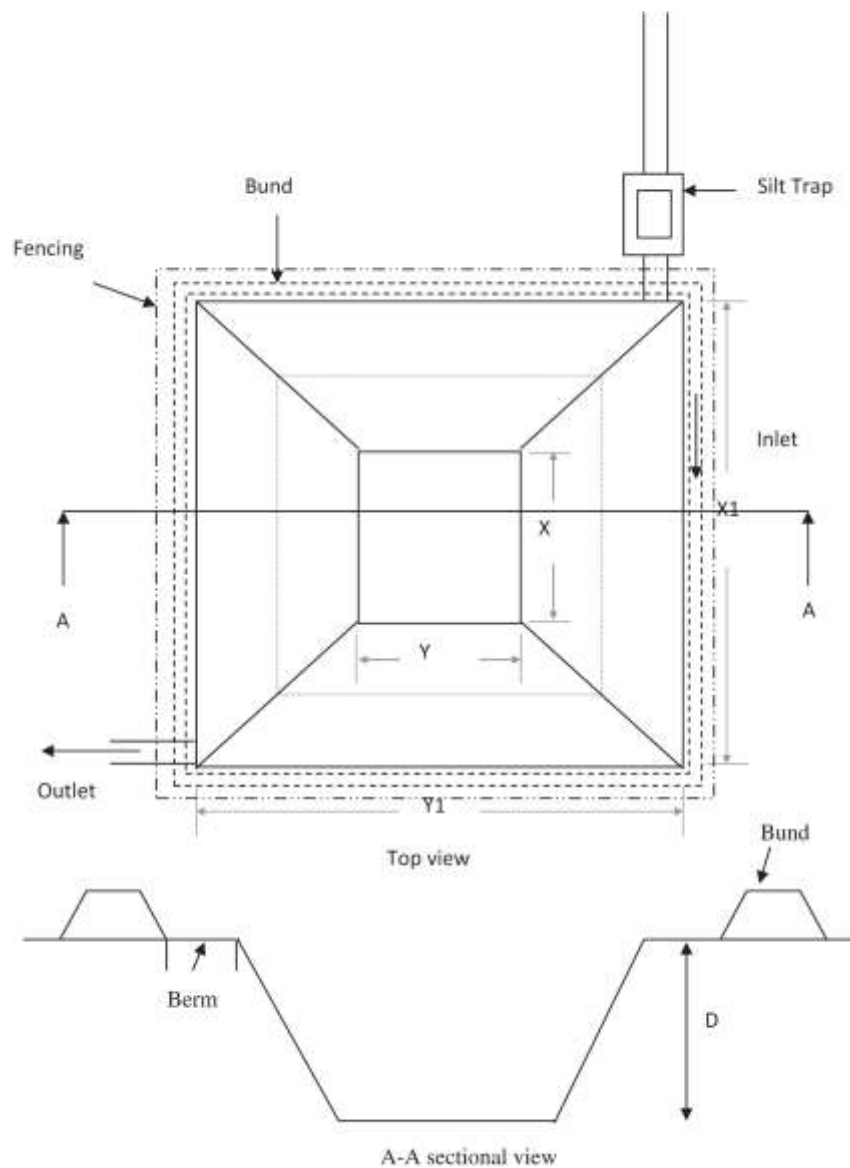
Layout of a Farm Pond (MWI, 2015)
